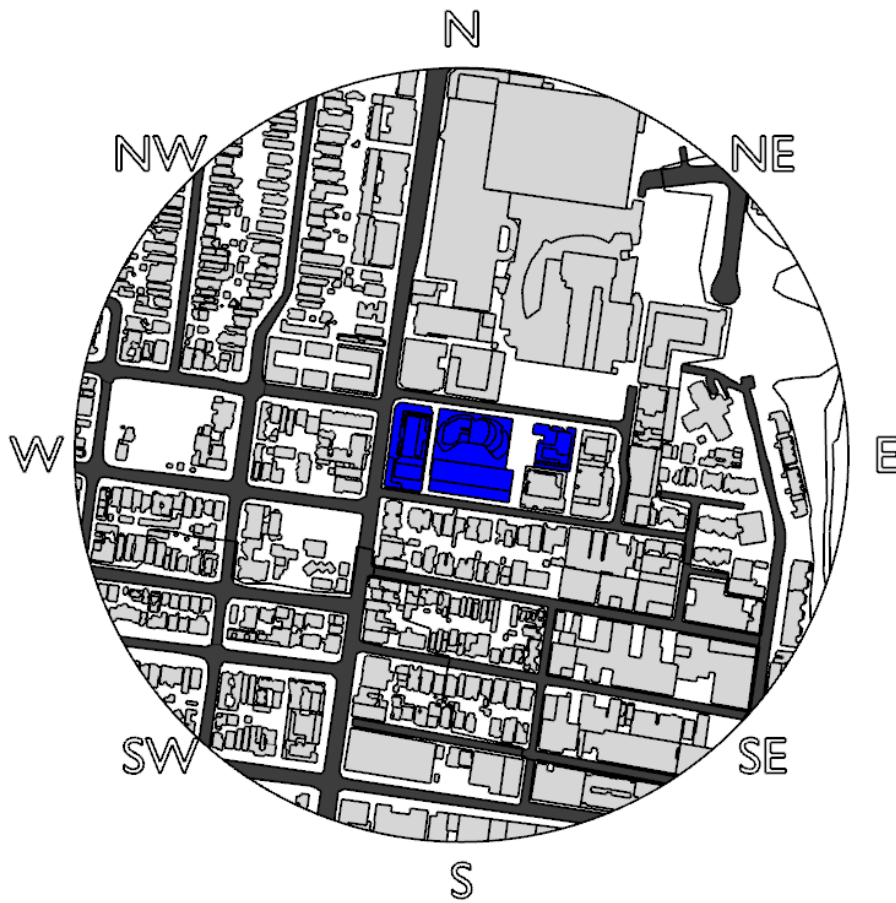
Proximity Model Plan (Proposed Site Conditions)
